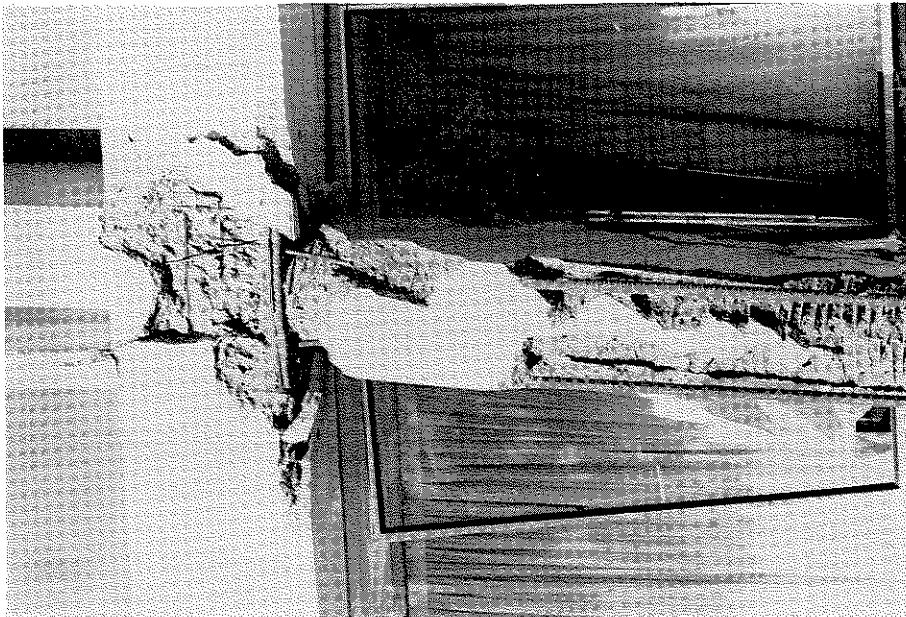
31 Connection damage between second floor beam and spiral column, Olive View Hospital
